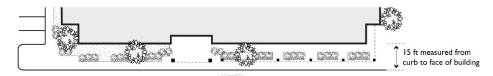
A.1: FOUNDATION BASE AT EXTERIOR WALL WITH PUBLIC ENTRANCE
